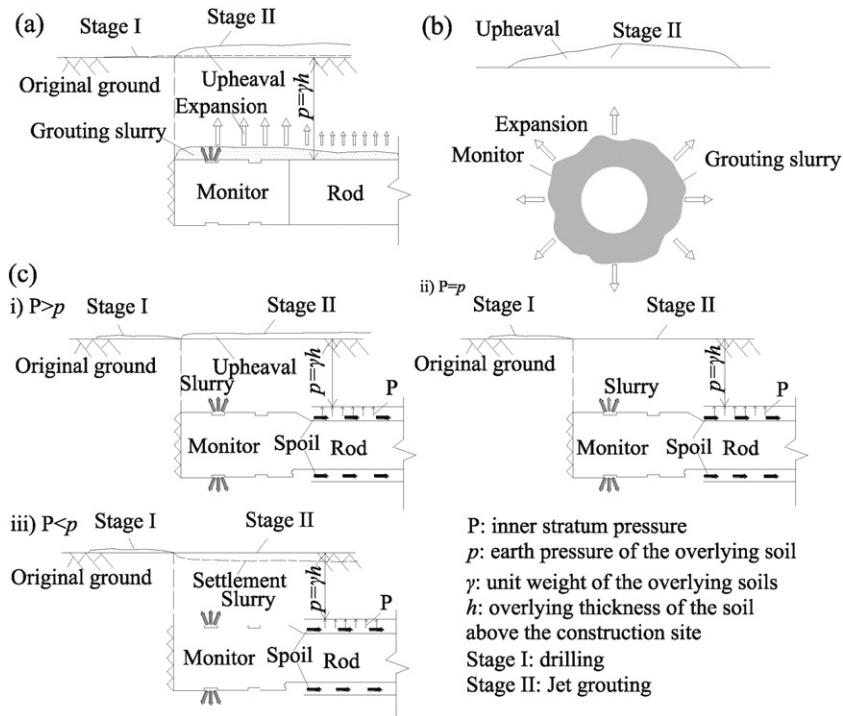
Mechanism of load transferring during jet grouting: a) longitudinal view of the ground movement; b) Sectional view of the ground upheaval due to grouting slurry; c) ground movement model of the horizontal jet grouting construction.
